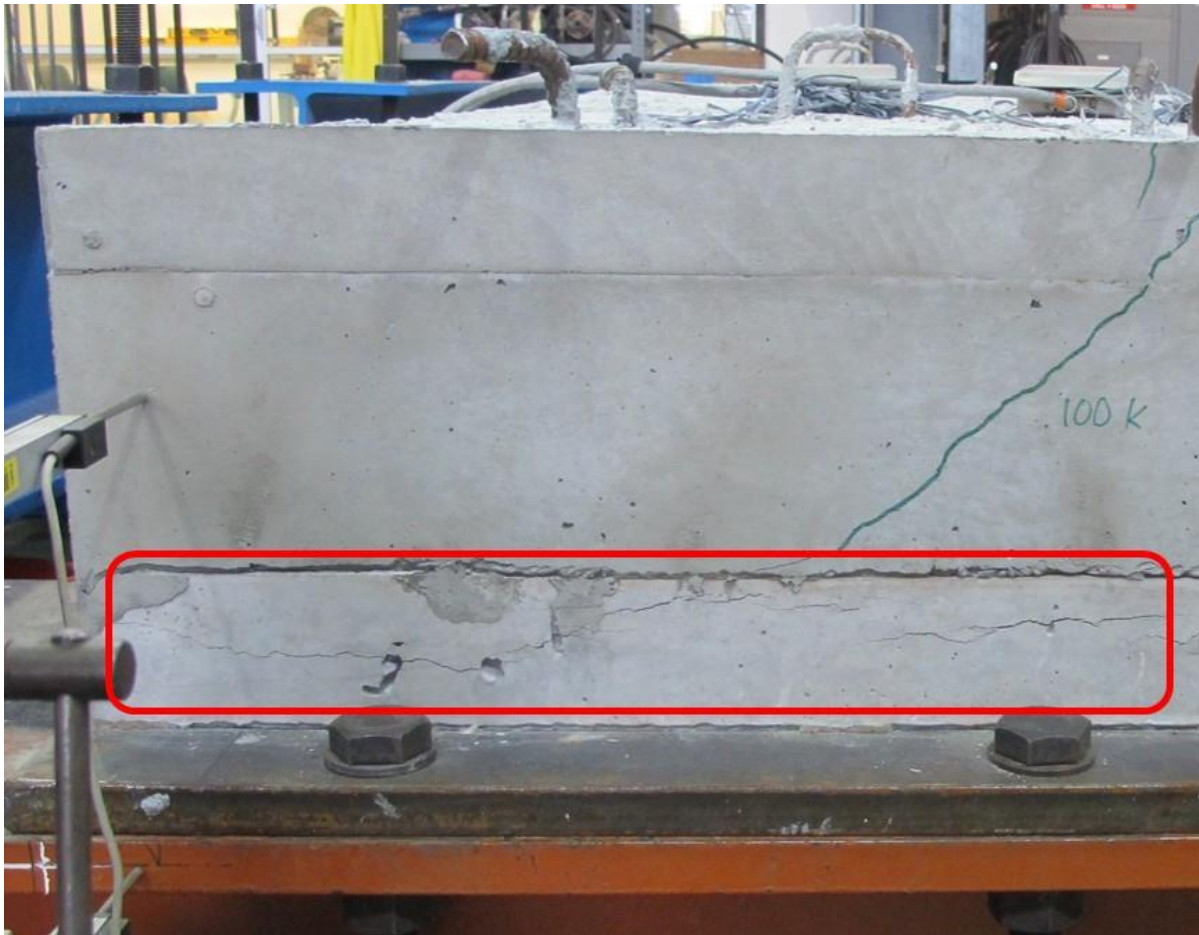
Cracking in "Girder" Concrete of High Eccentricity Specimen
